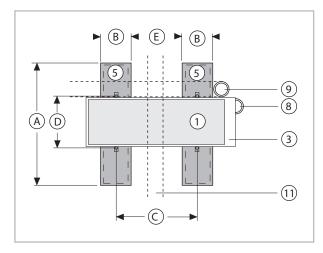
Dimensions for the strip foundation (bird's eye view)
